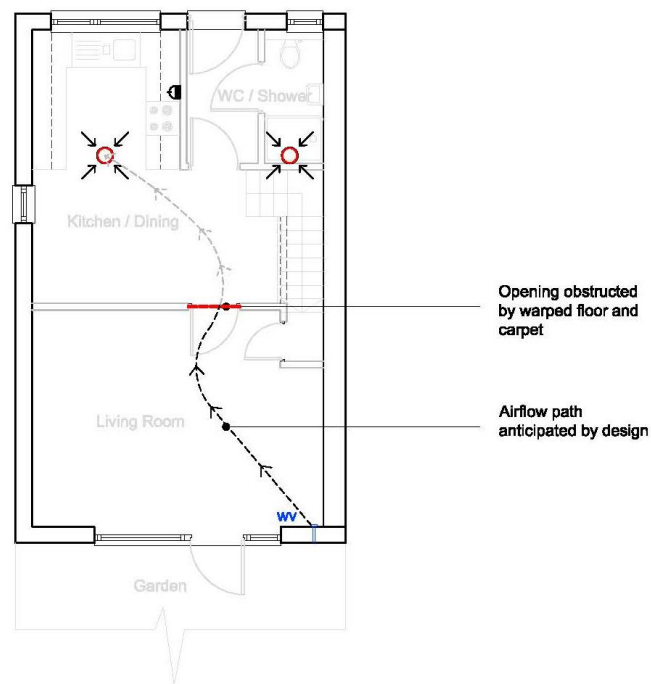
Plan showing how the ventilation design could be compromised by poorly installed floor combined with resident's modifications to building fabric (1:150)
